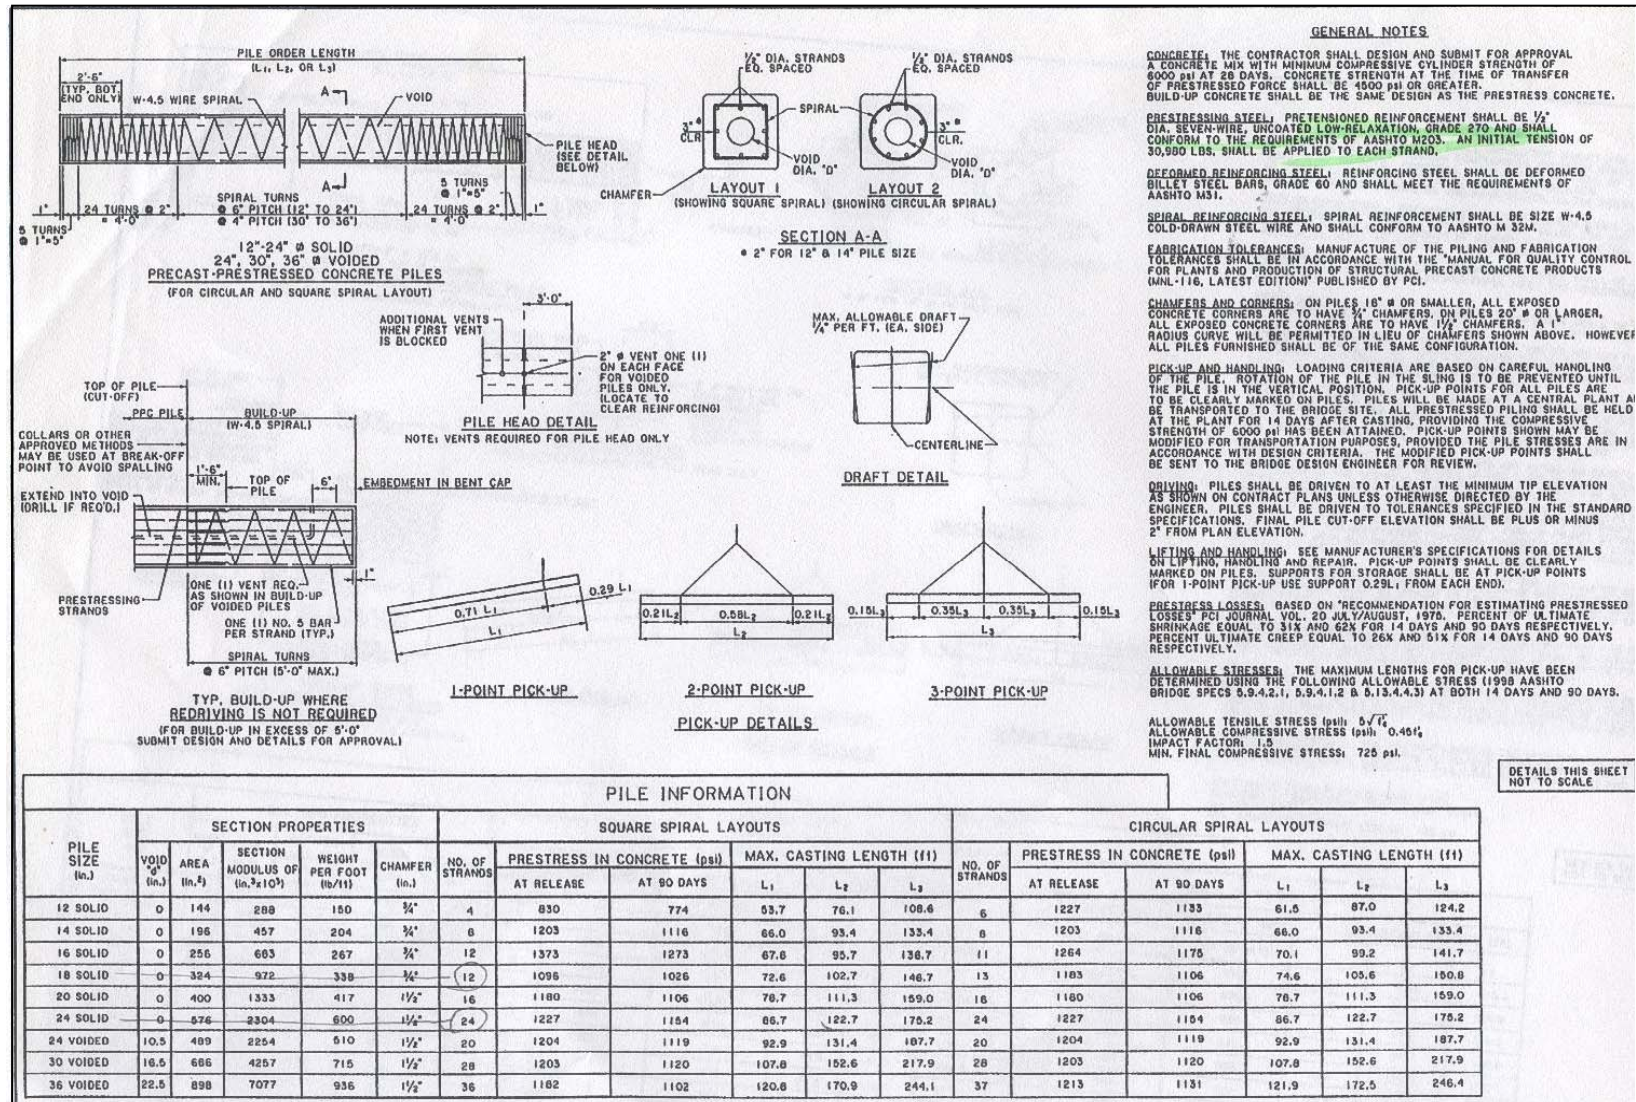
Details of Precast-Prestressed Concrete Piles (Modified), Standard Detail: CS-216 MOD (LA-DOTD BDM 2004)
